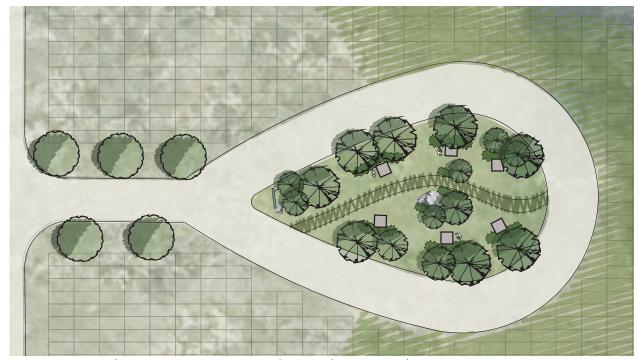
New Development Area Amenity Space Schematic Plan, Not to Scale
